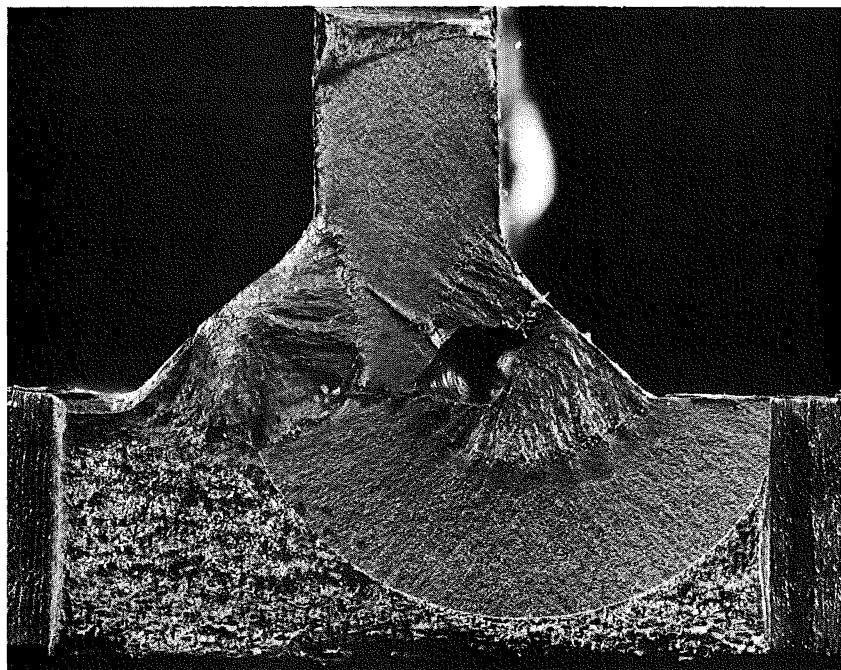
Crack in flange-to-web junction approaching the extreme fibre of the tension flange ($x3.6$)
